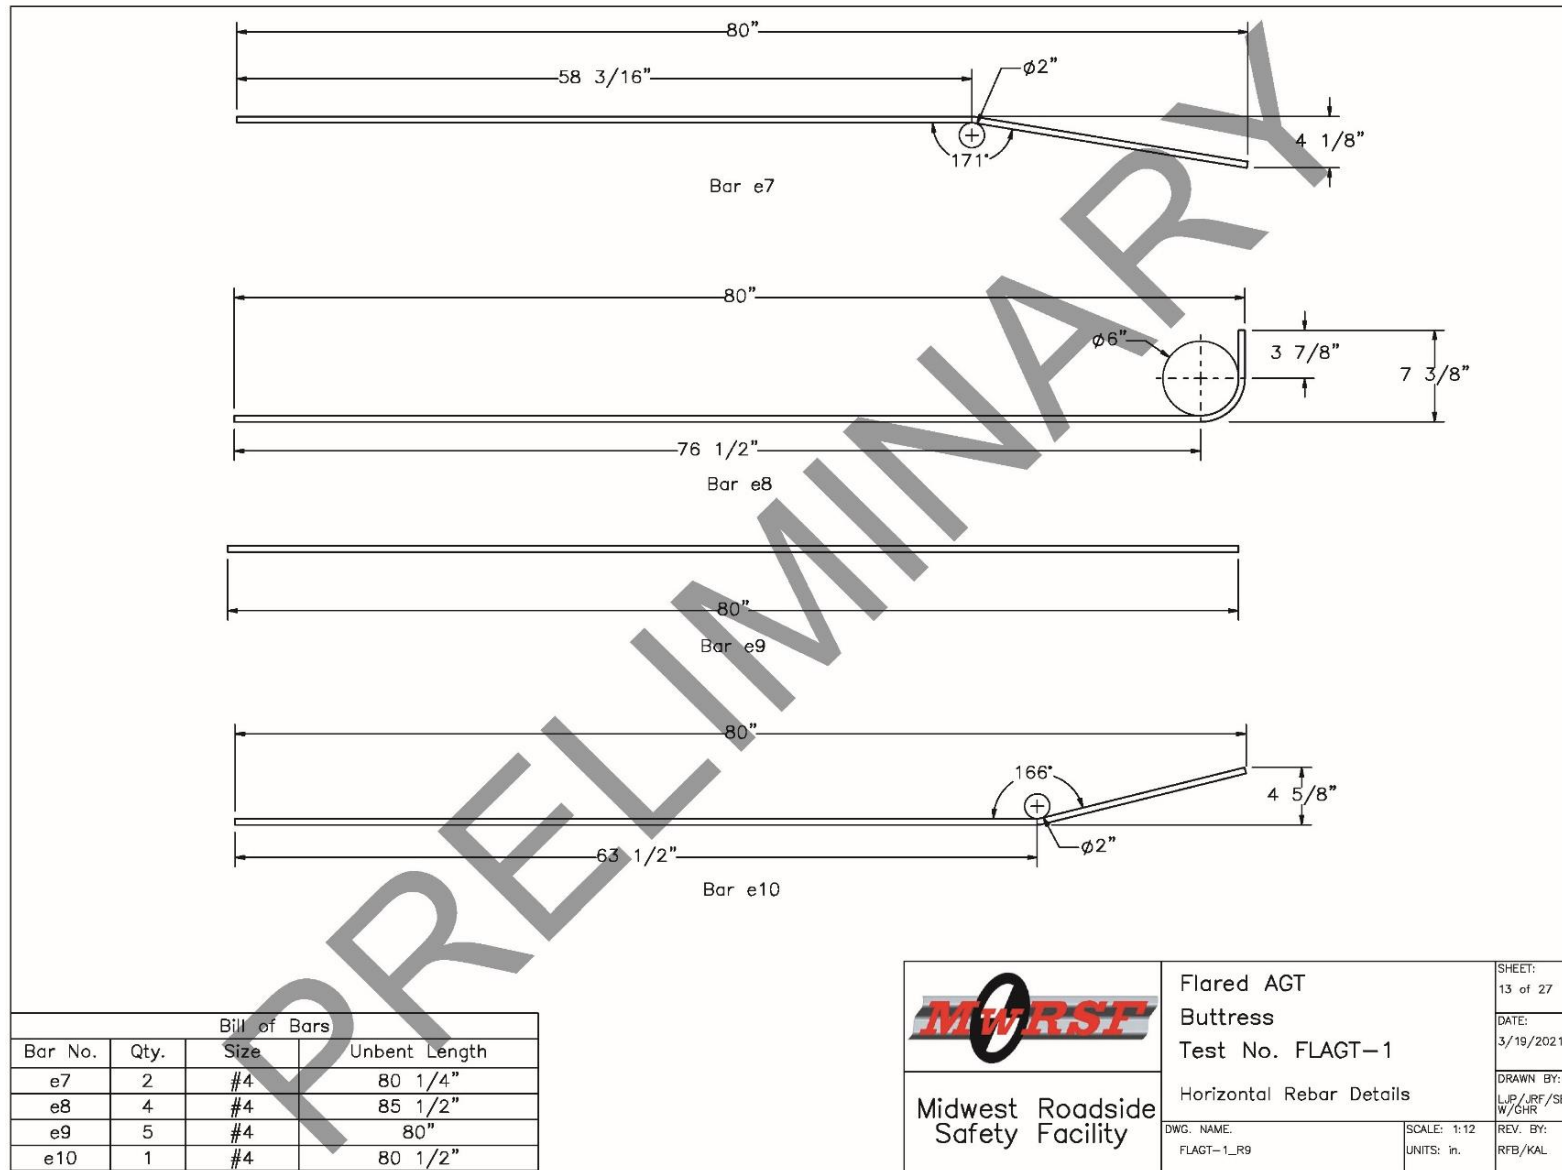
Horizontal Rebar Details, Test No. FLAGT-1
